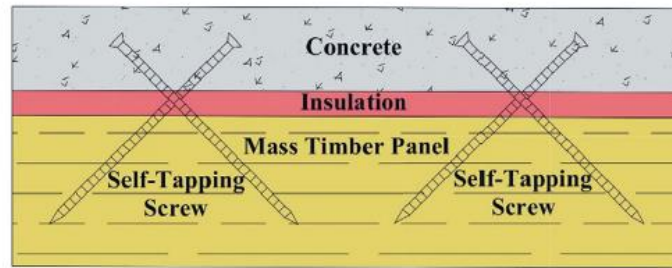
Timber-concrete composite floor (Mirdad and Chui, 2019)
